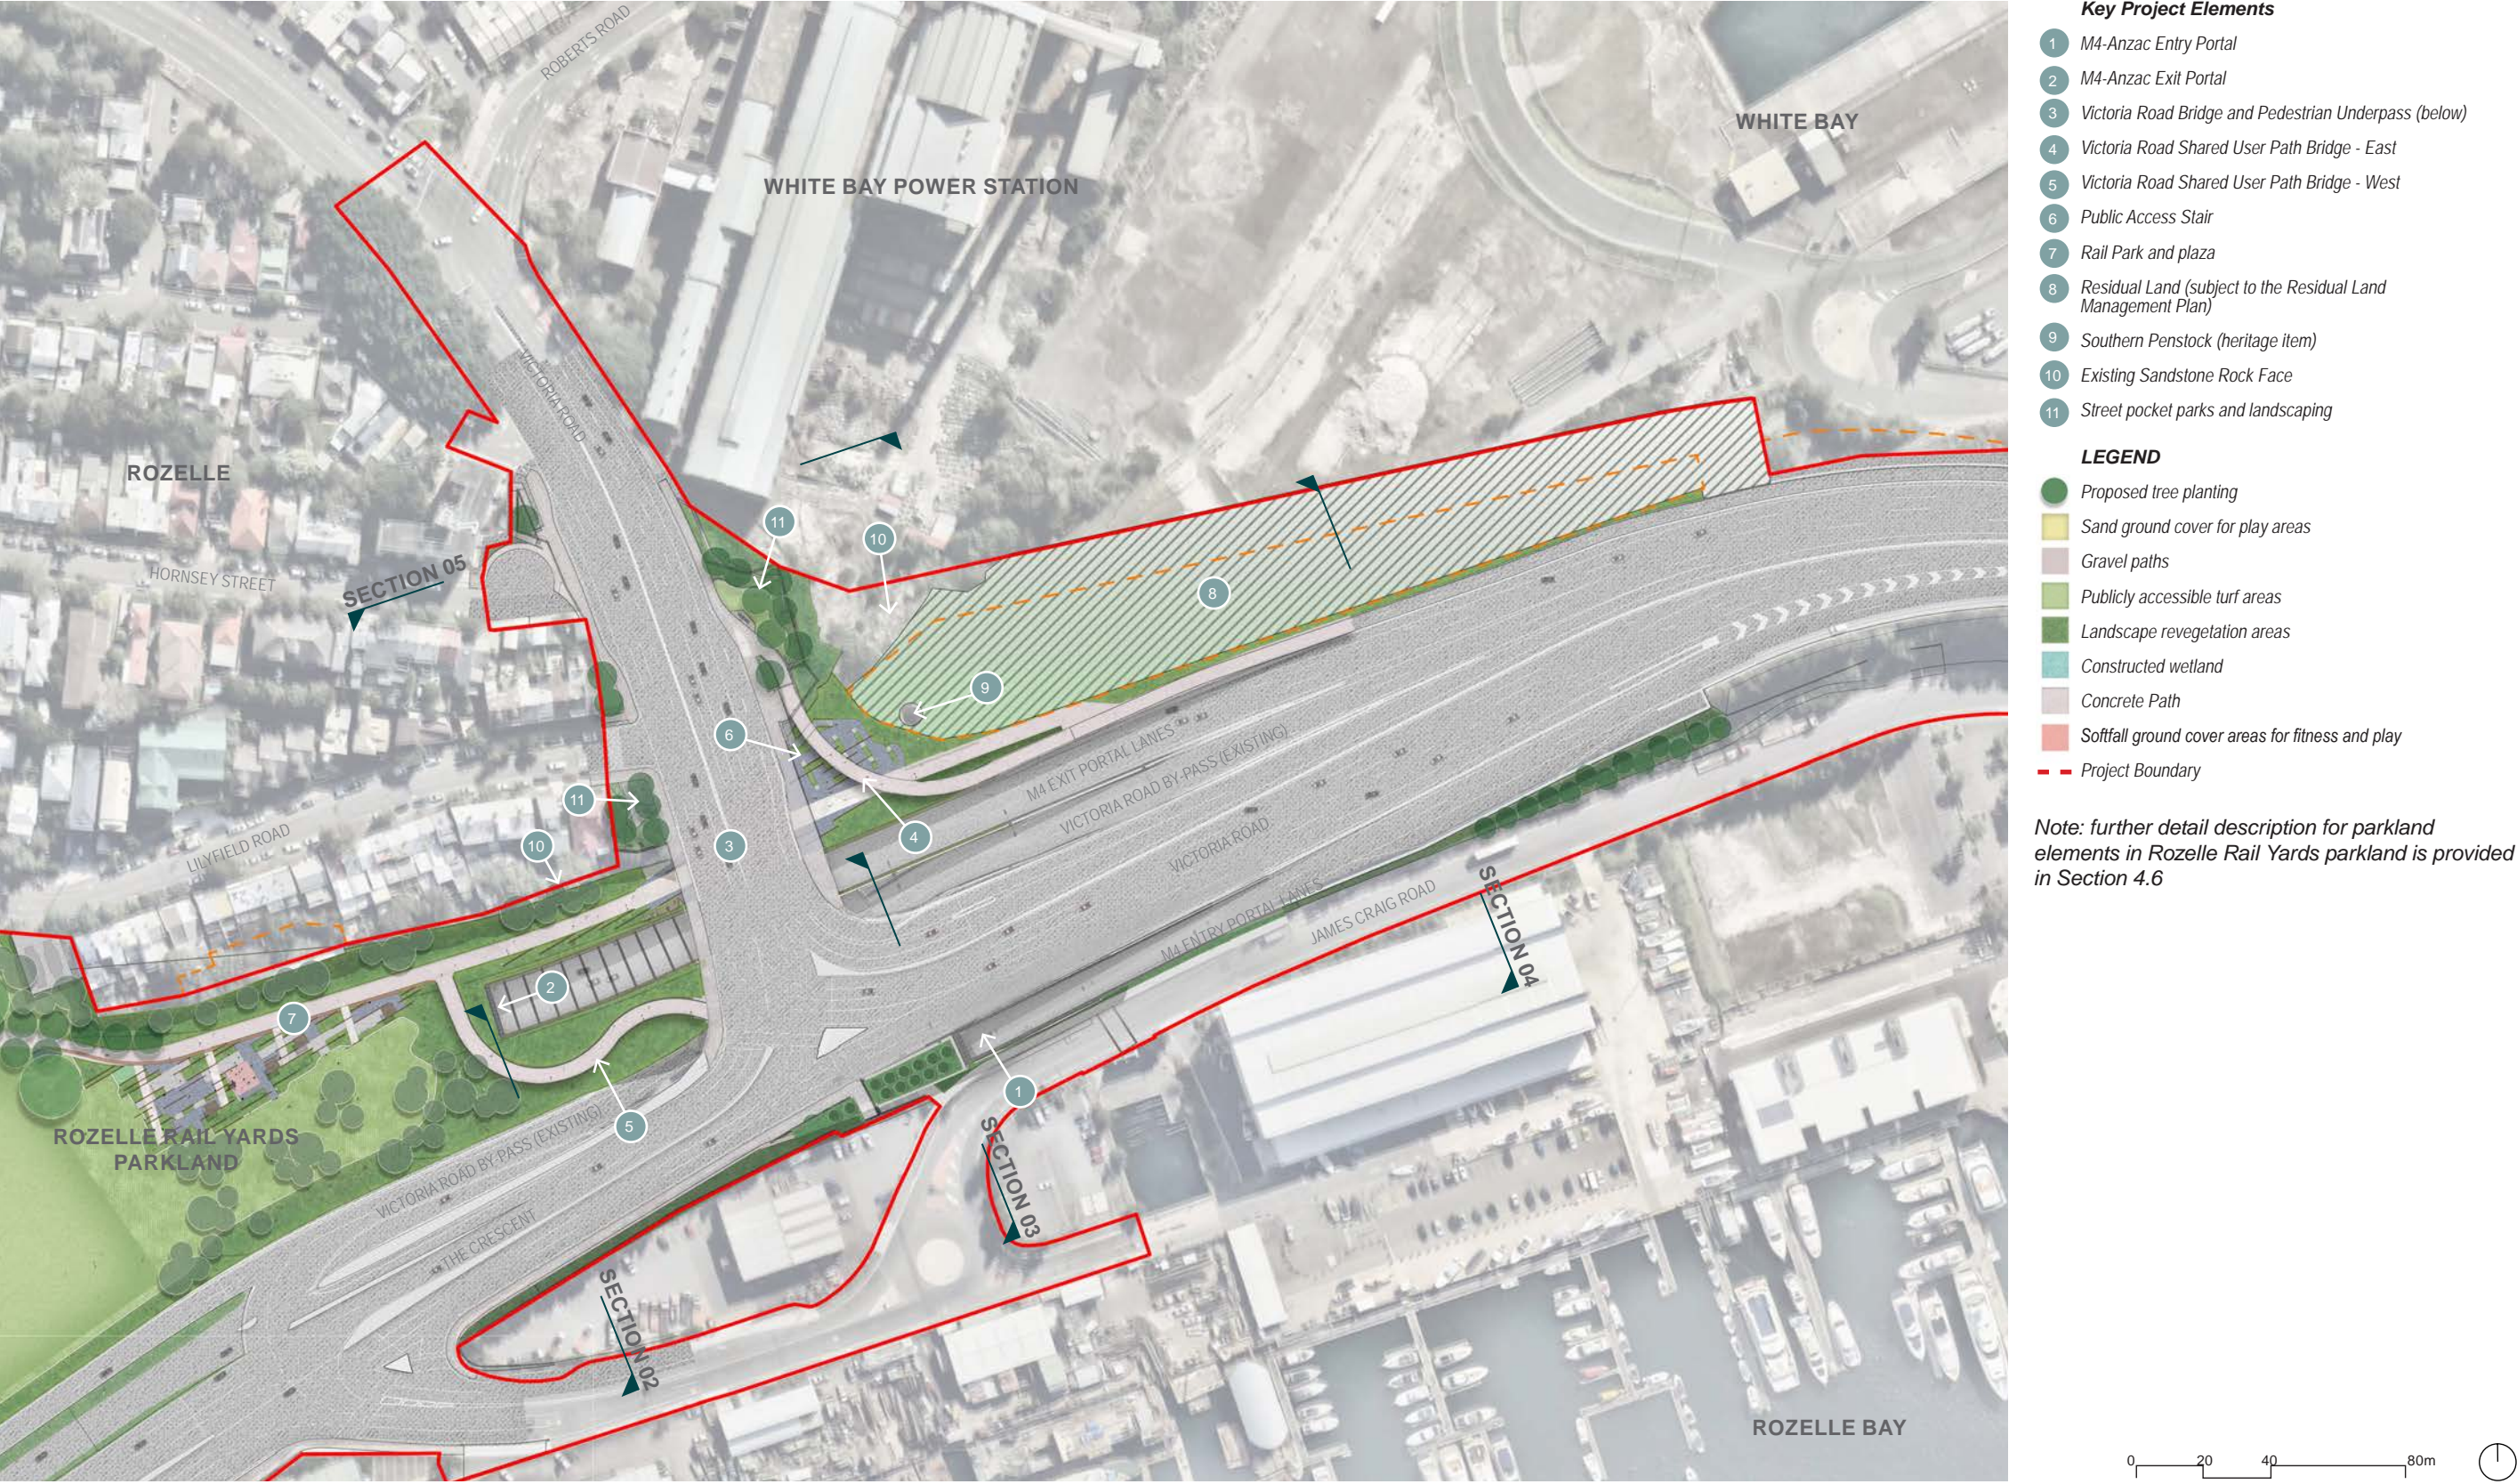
Rozelle - Concept Plan - Drawing 3 of 4
